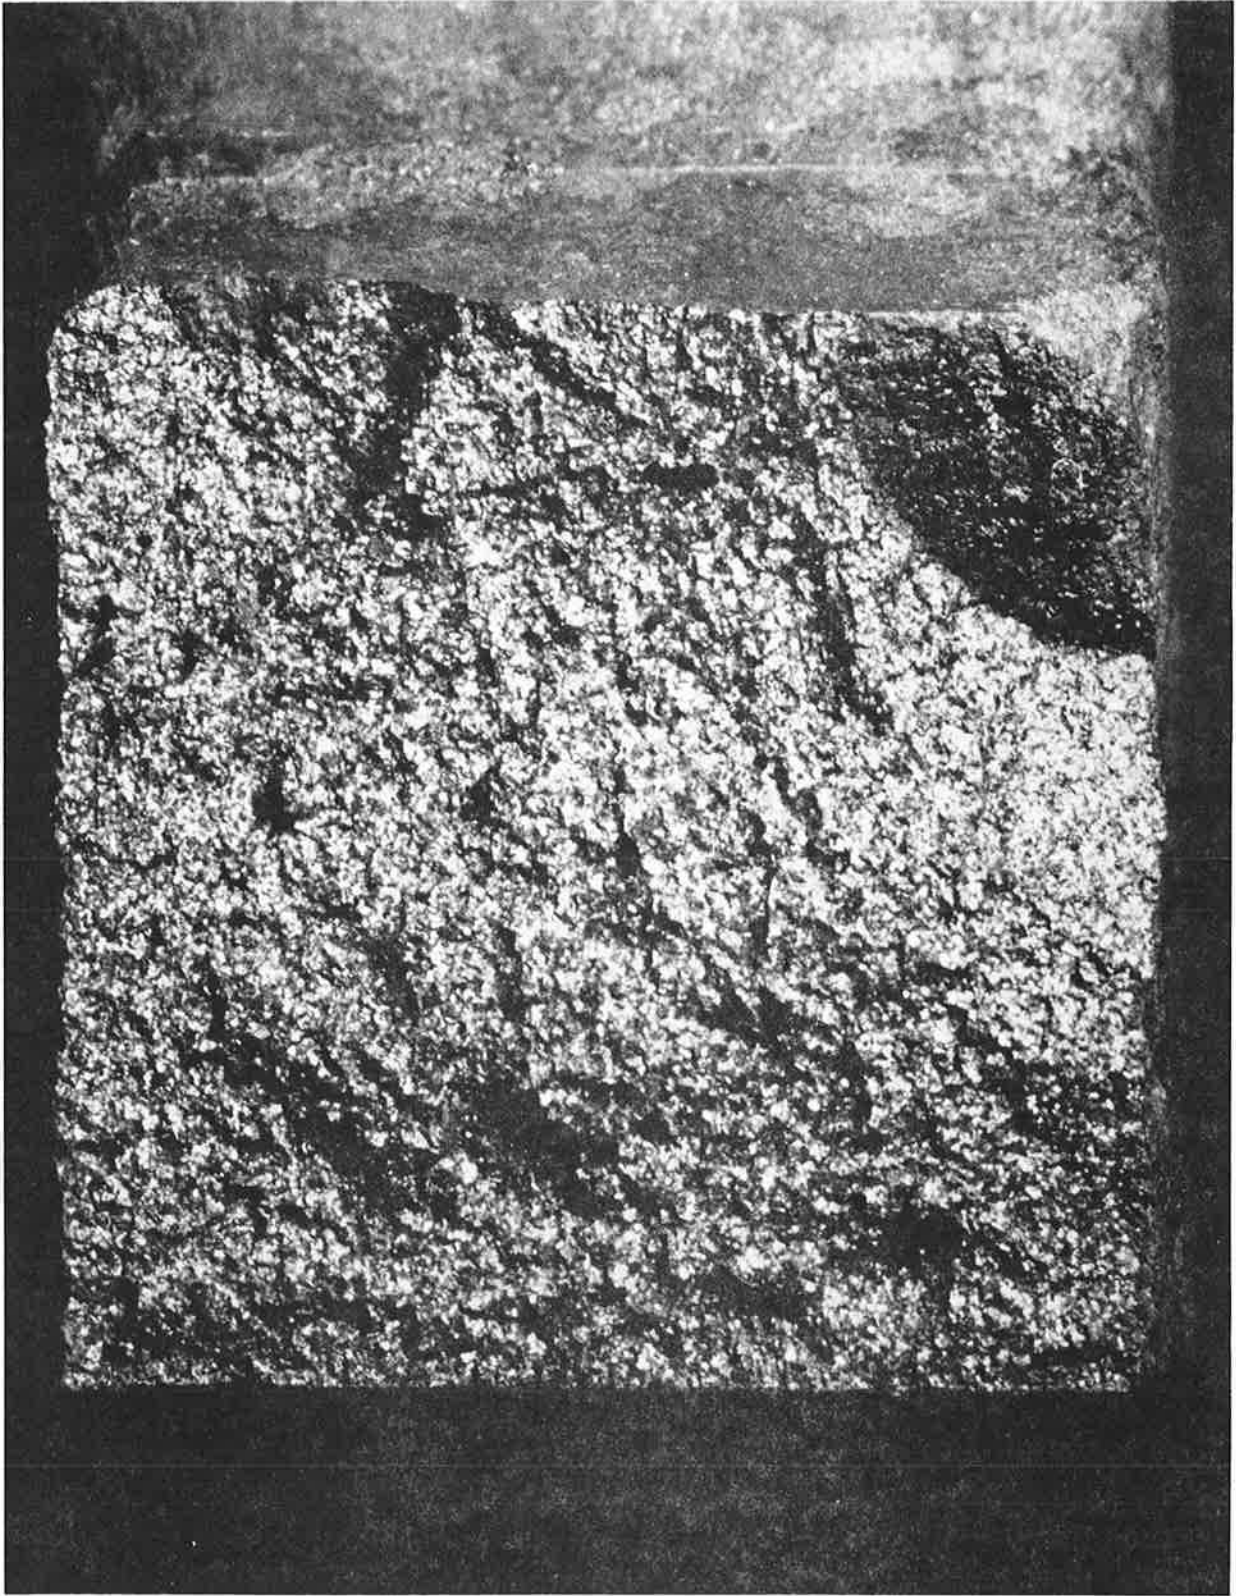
Preexisting 1/4-inch Crack—Milepost 107.27
